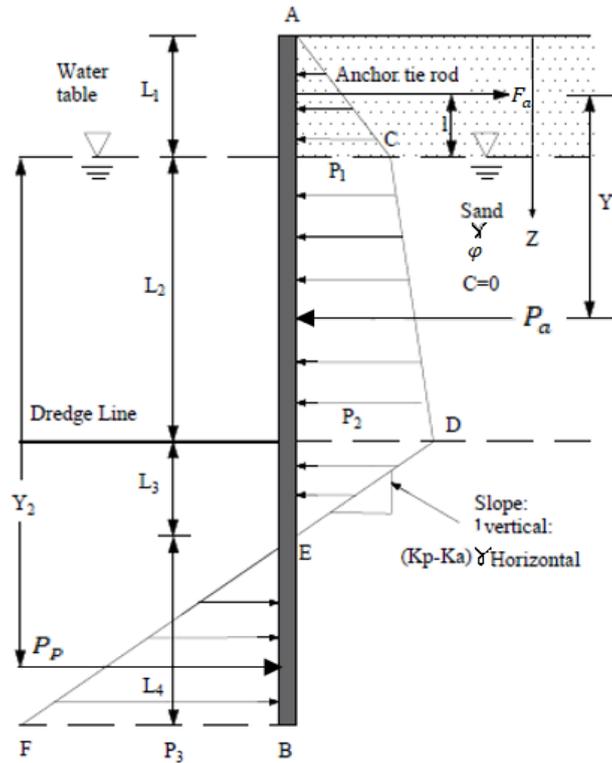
Design of anchored sheet pile wall penetrating in sand without surcharge condition.
